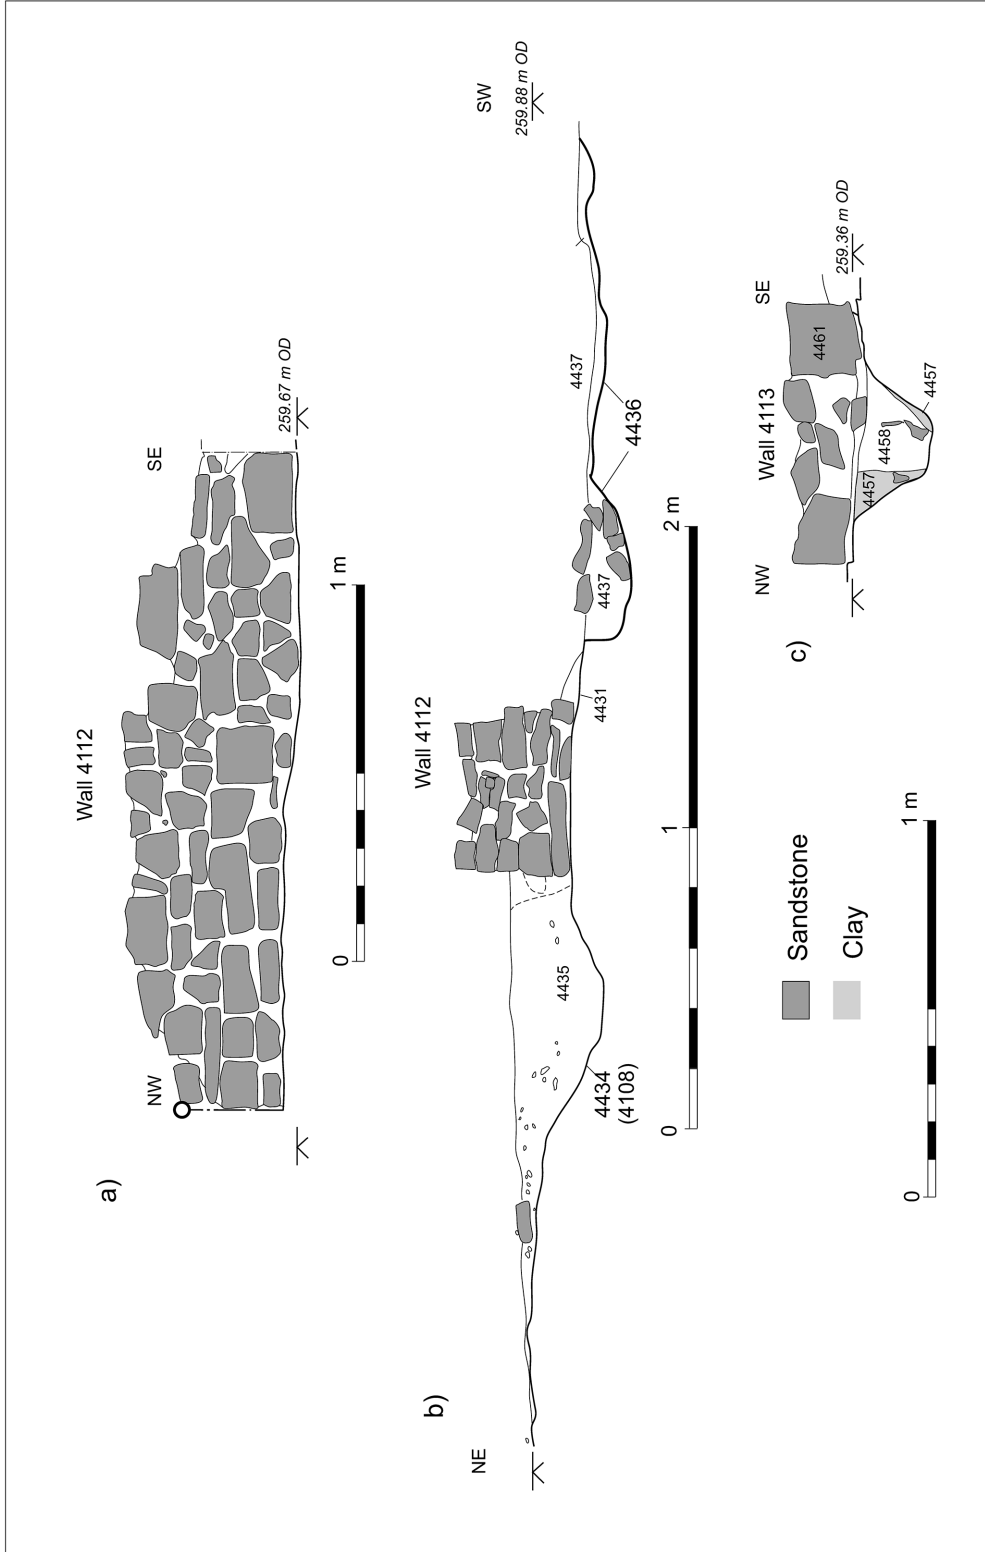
a) West-facing elevation of wall 4112; b) North-west-facing section through wall 4112 and gullies 4108 and 4436; c) South-west-facing section showing end of wall 4113 and probable doorway 4457.
